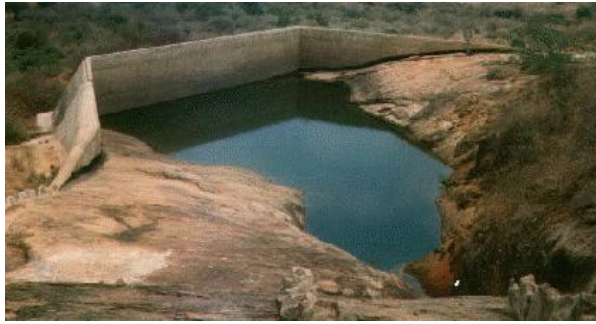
Vertical wall around the outer edge of a depression in a rocky surface to harvest water.
